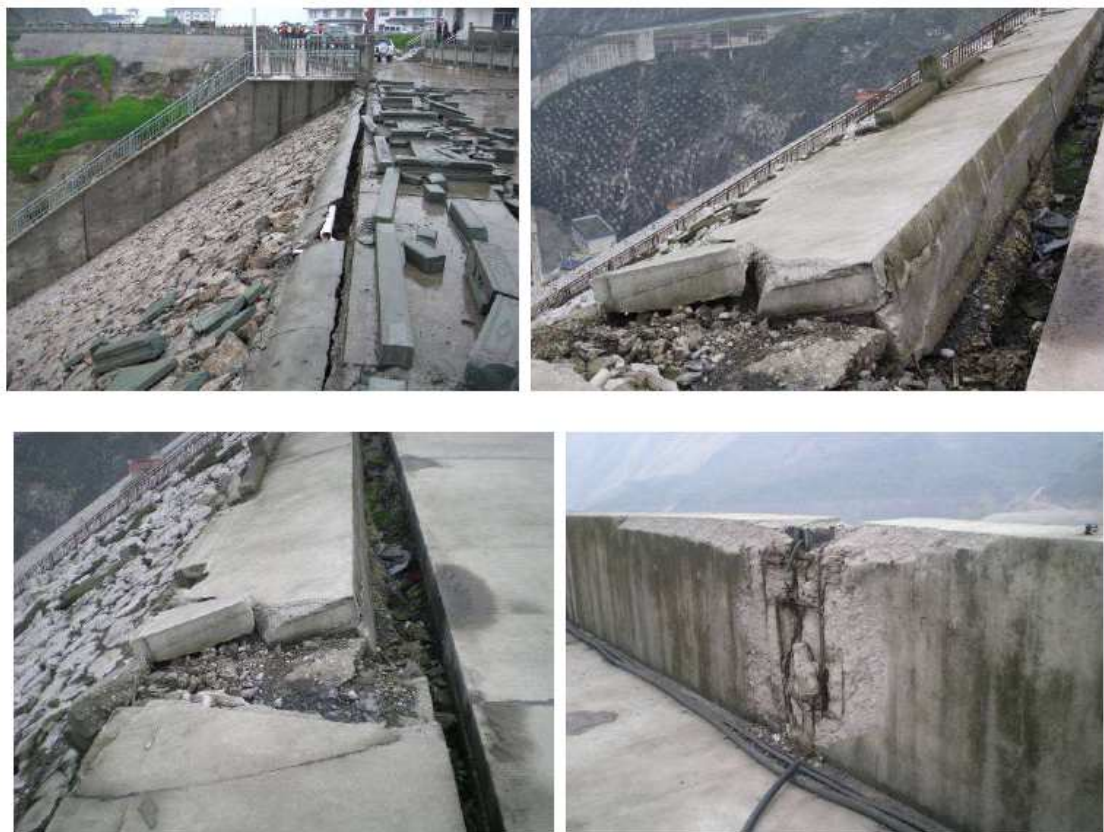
Damage at crest (downstream edge)(top left, top right, and bottom left), and damage at joint of upstream parapet wall(bottom right)<sup>34)</sup>
